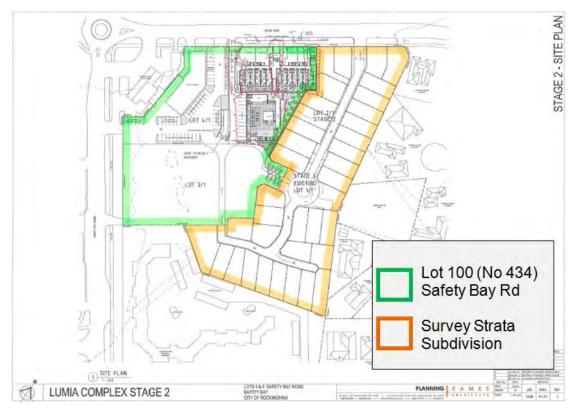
Location of the development site (Stage 2) within the draft Staging Plan
